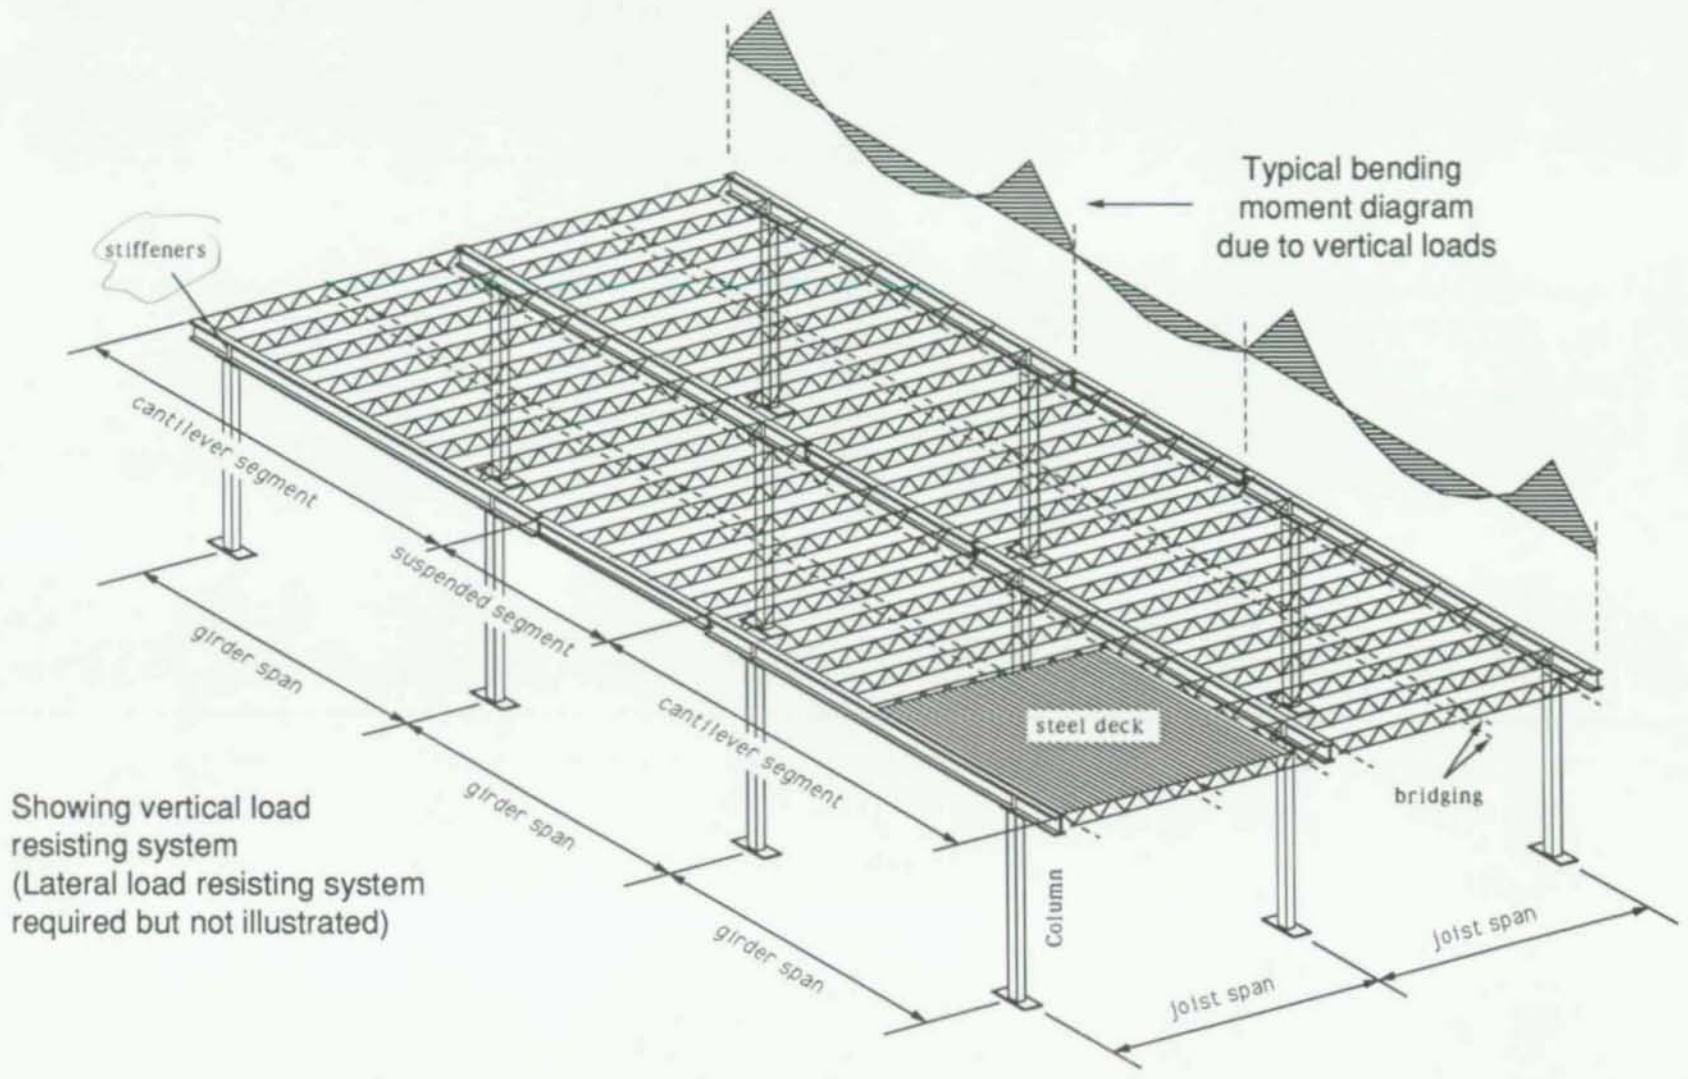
Roof Construction using Cantilever (Gerber) Girder and OWSJ Framing
